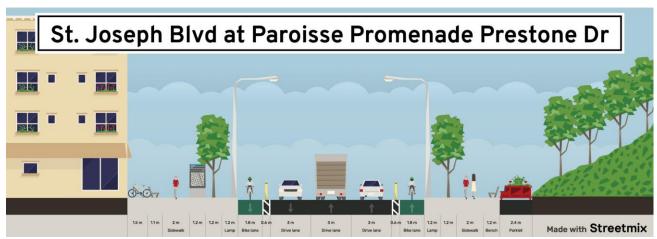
Streetscape cross-section of St. Joseph Blvd at Paroisse Promenade Prestone Drive.
